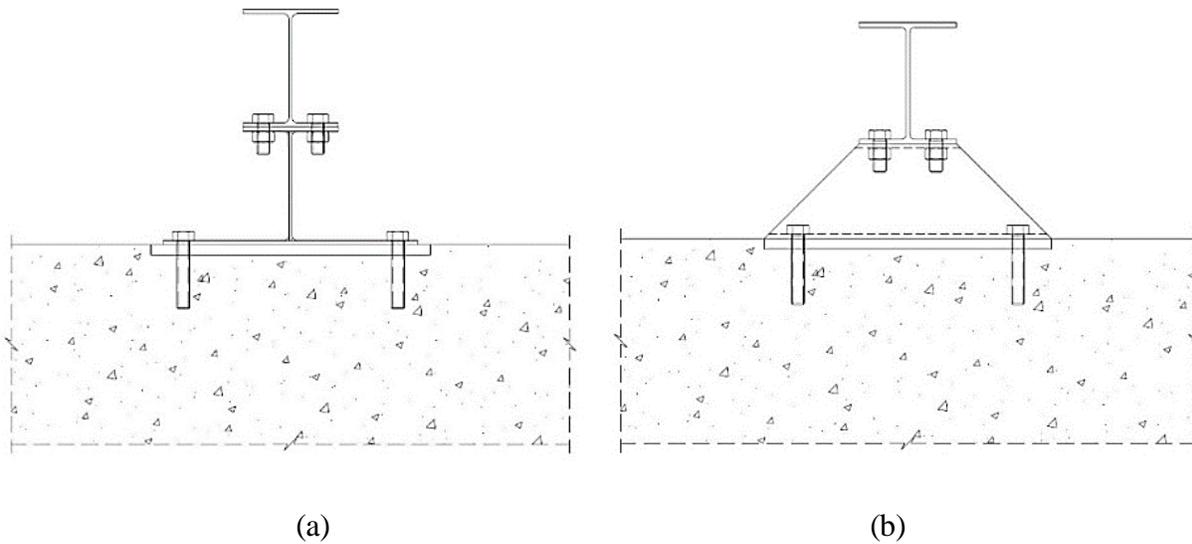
Structural Spacer as a: (a) Built-up I-section Spacer, or (b) Longitudinal Tube Spacer
